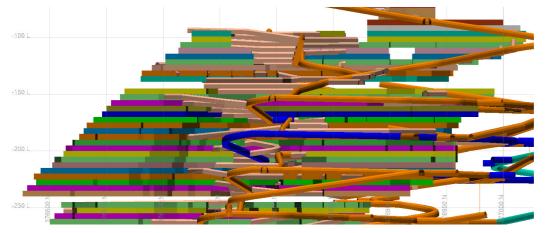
Typical level development showing multiple districts and flitches: looking down, south and west.
